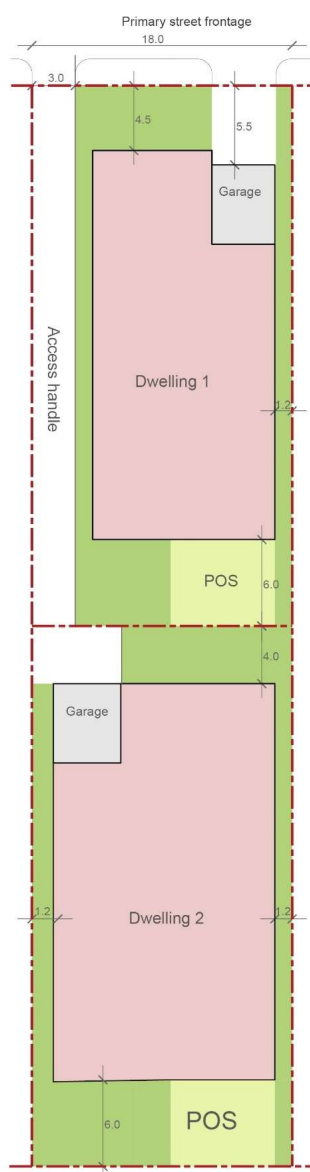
Single dwelling battle-axe street facing (Note: dimensions are in metres)
